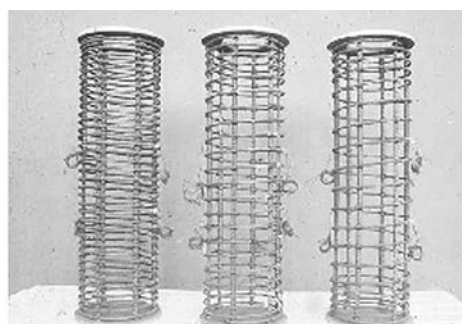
Typical reinforcement cages for concrete prisms and cylinders.
